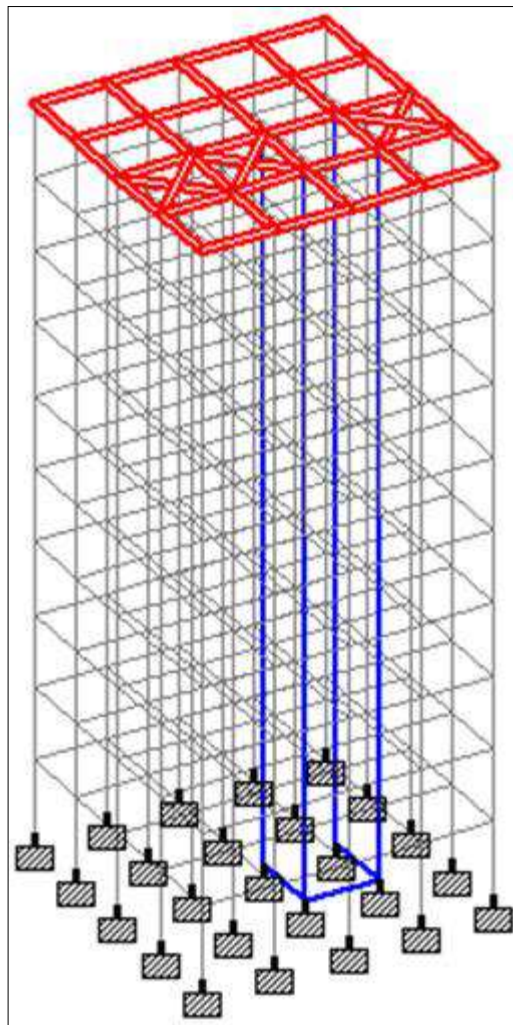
Model-VII: Outrigger (bracings) at top (ninth) floor with core wall (EQ-5)
